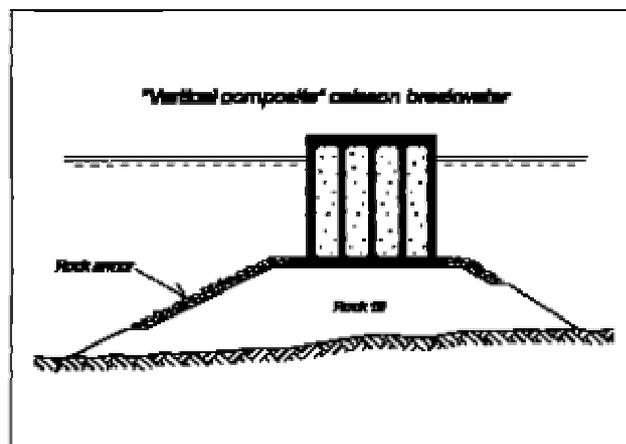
Cross-section of Vertical Composite Breakwater (CEM, 2003)
